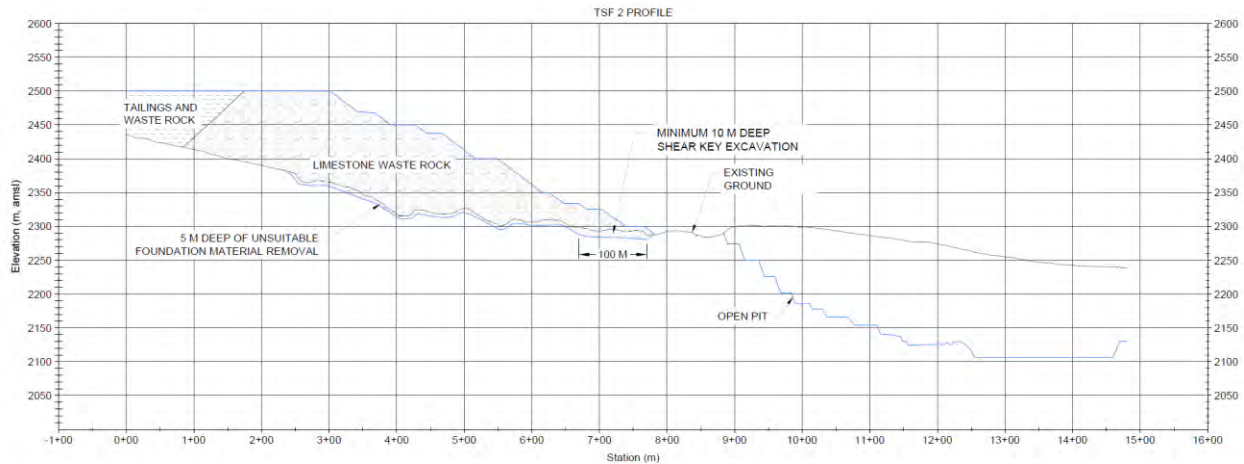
West Tailings and Rock Storage Facility Northern Portion Cross Section - LOM Author SRK, 24 January 2019.
